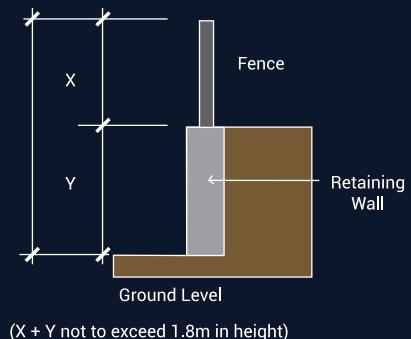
Lot fencing abutting a road reserve on a retaining wall
